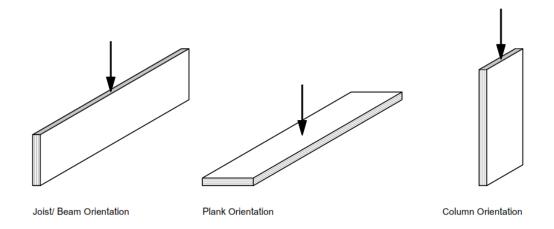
Illustration of LVL in joist/beam, plank, and column orientations
